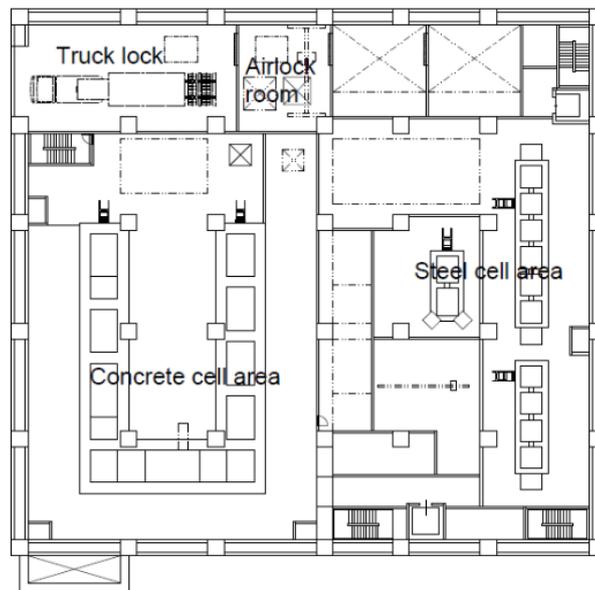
Schematic layout of Laboratory-2 (First floor plan).
